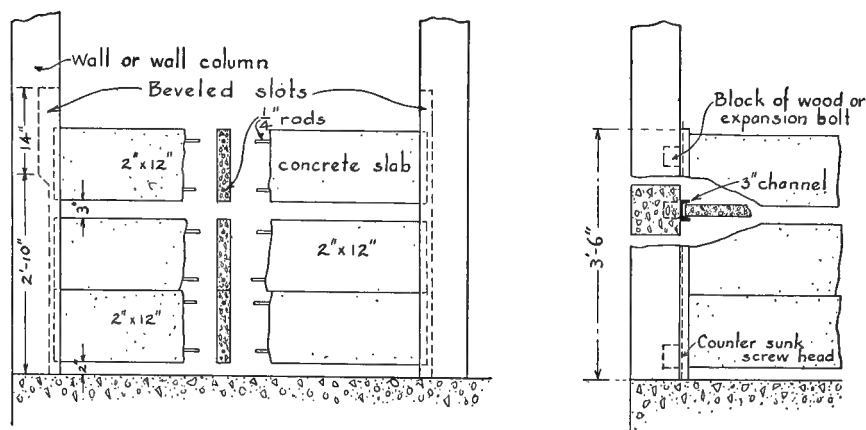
Concrete Slab Partition, made of 2 by 12-inch slabs, which fit into slots cast in the walls, or 3-inch channel iron screwed to wood blocks or wall plugs.
